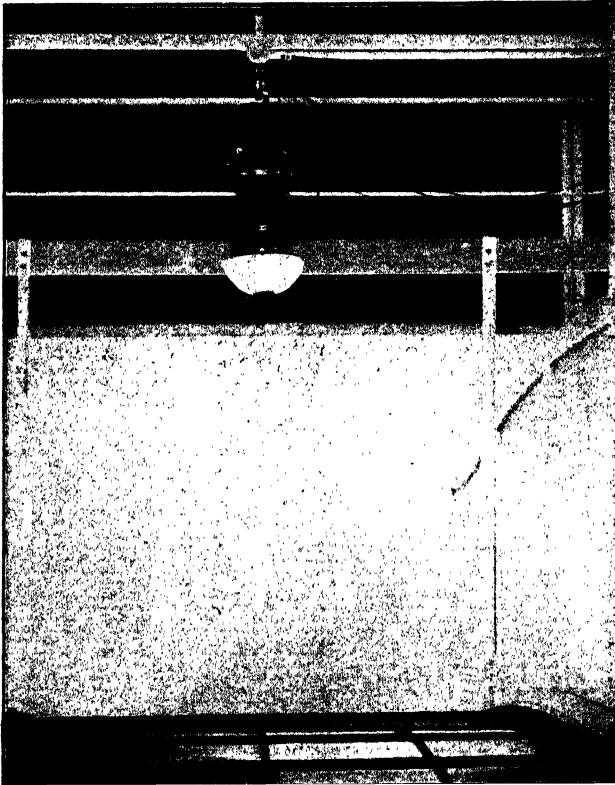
Arc Lamps above a Glass Ceiling.
